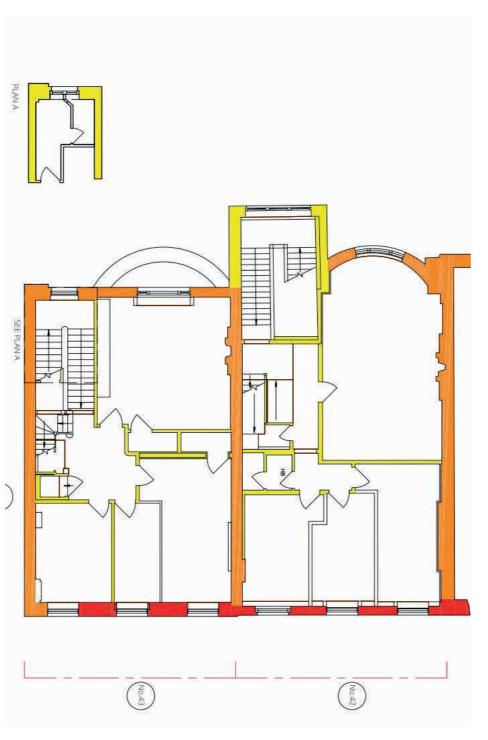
Second floor significance plan at 42-43 Russell Square
